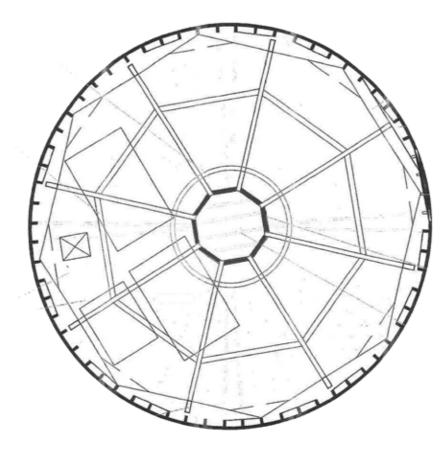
Inner apex ring beam (I) in plan view (2019) © H&R (SLHA edit)
